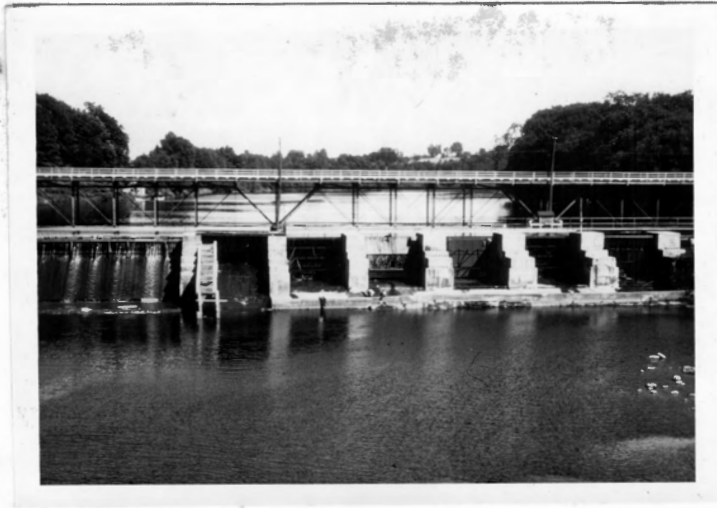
Newaygo Dam, Muskegon River, showing impoundment and Highway M-37 bridge in background. August, 1947.
